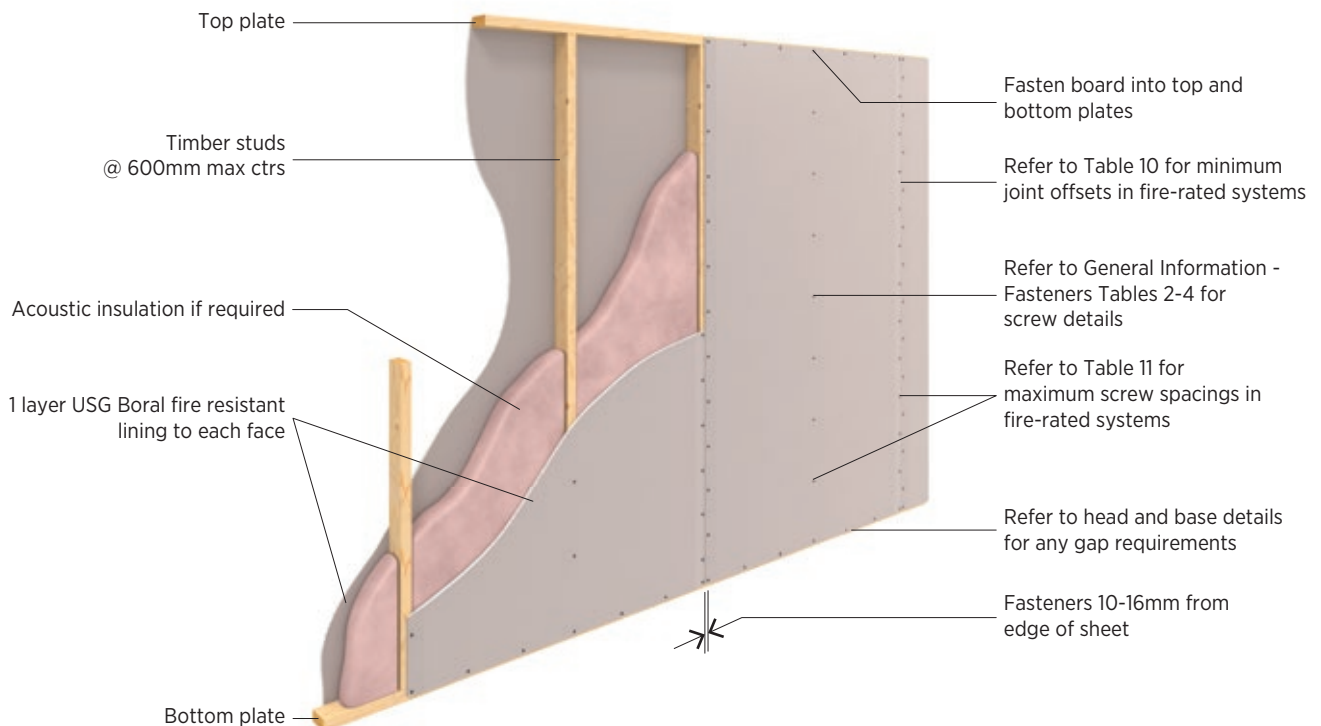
Fire-rated Timber Stud – Vertical Fixing – Single Layer
